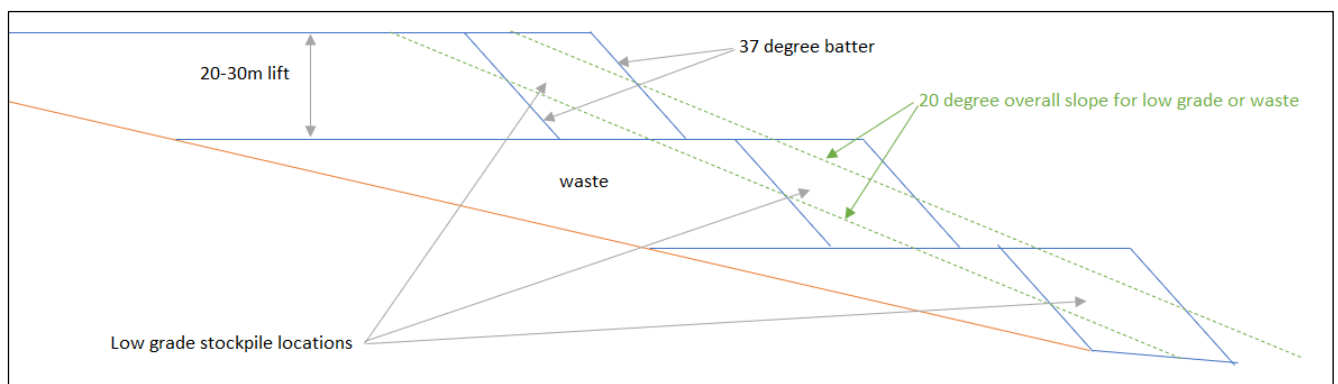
Schematic cross section of typical WRD and low-grade stockpile construction
